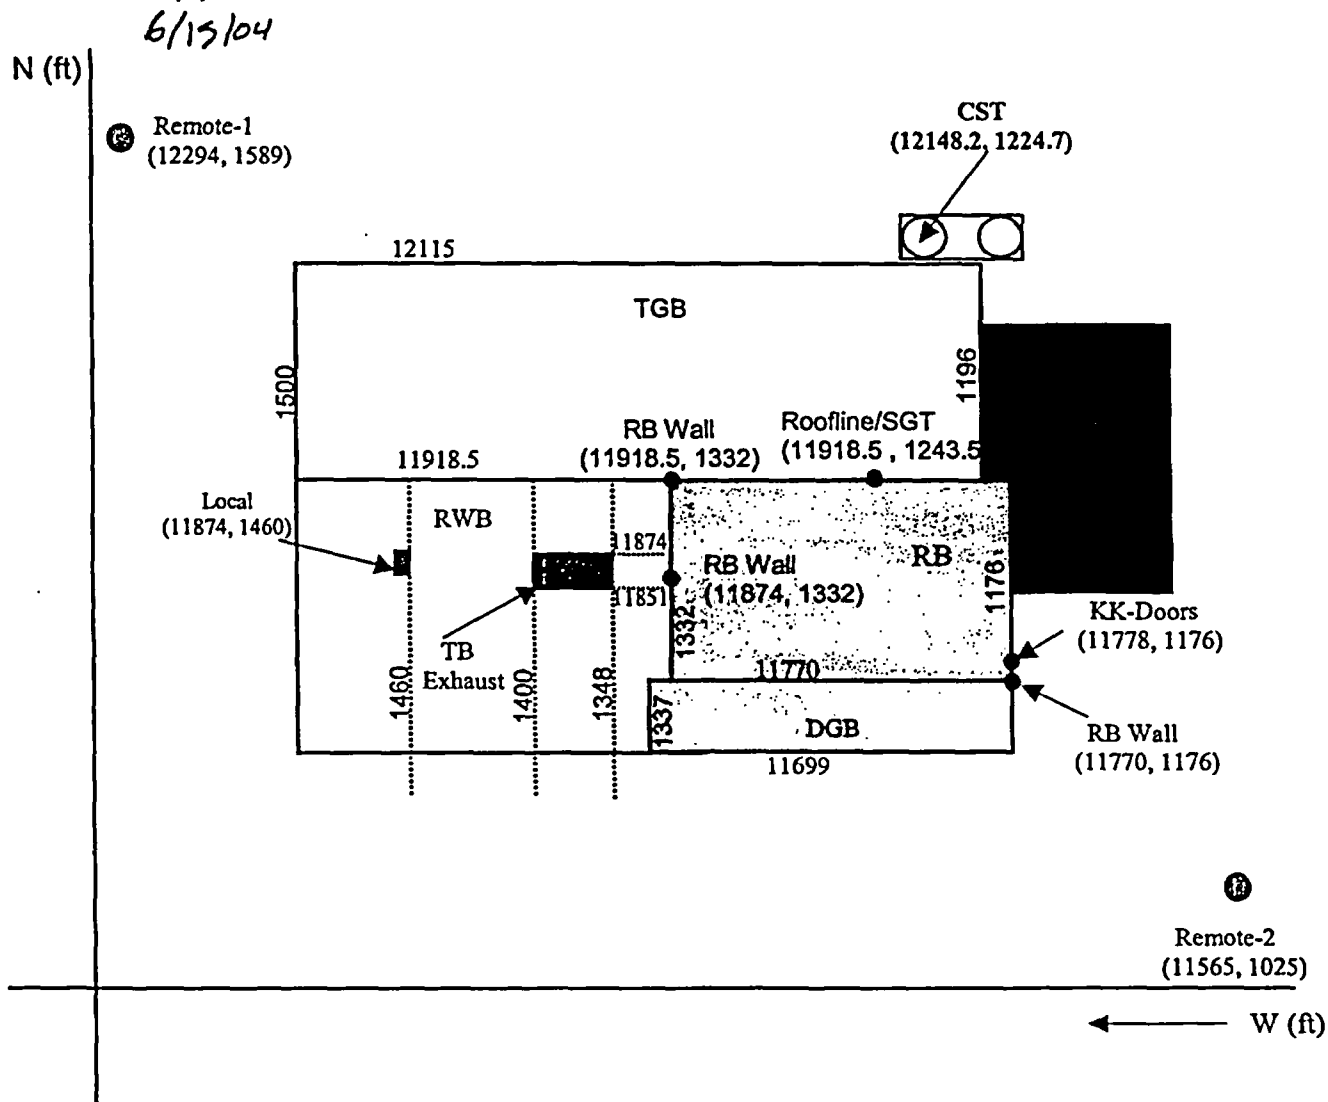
A schematic Layout of the Plant Structure Showing Sources and Intakes at CGS
